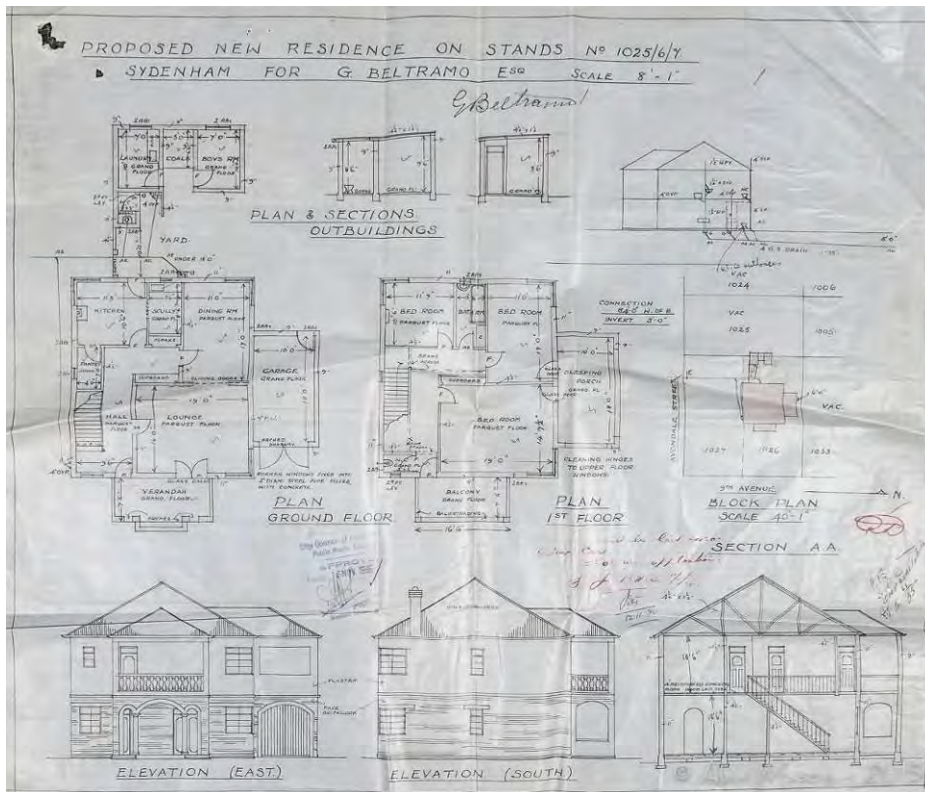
Plan for proposed residences on Stands 1025/6/7
